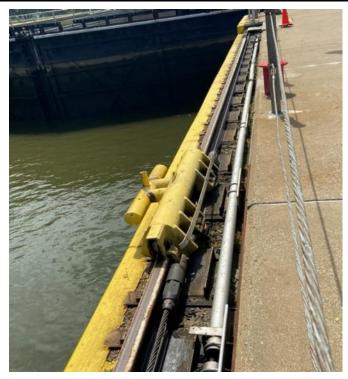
Existing Montgomery Lock – rail located 12 in. below top of the lock wall
